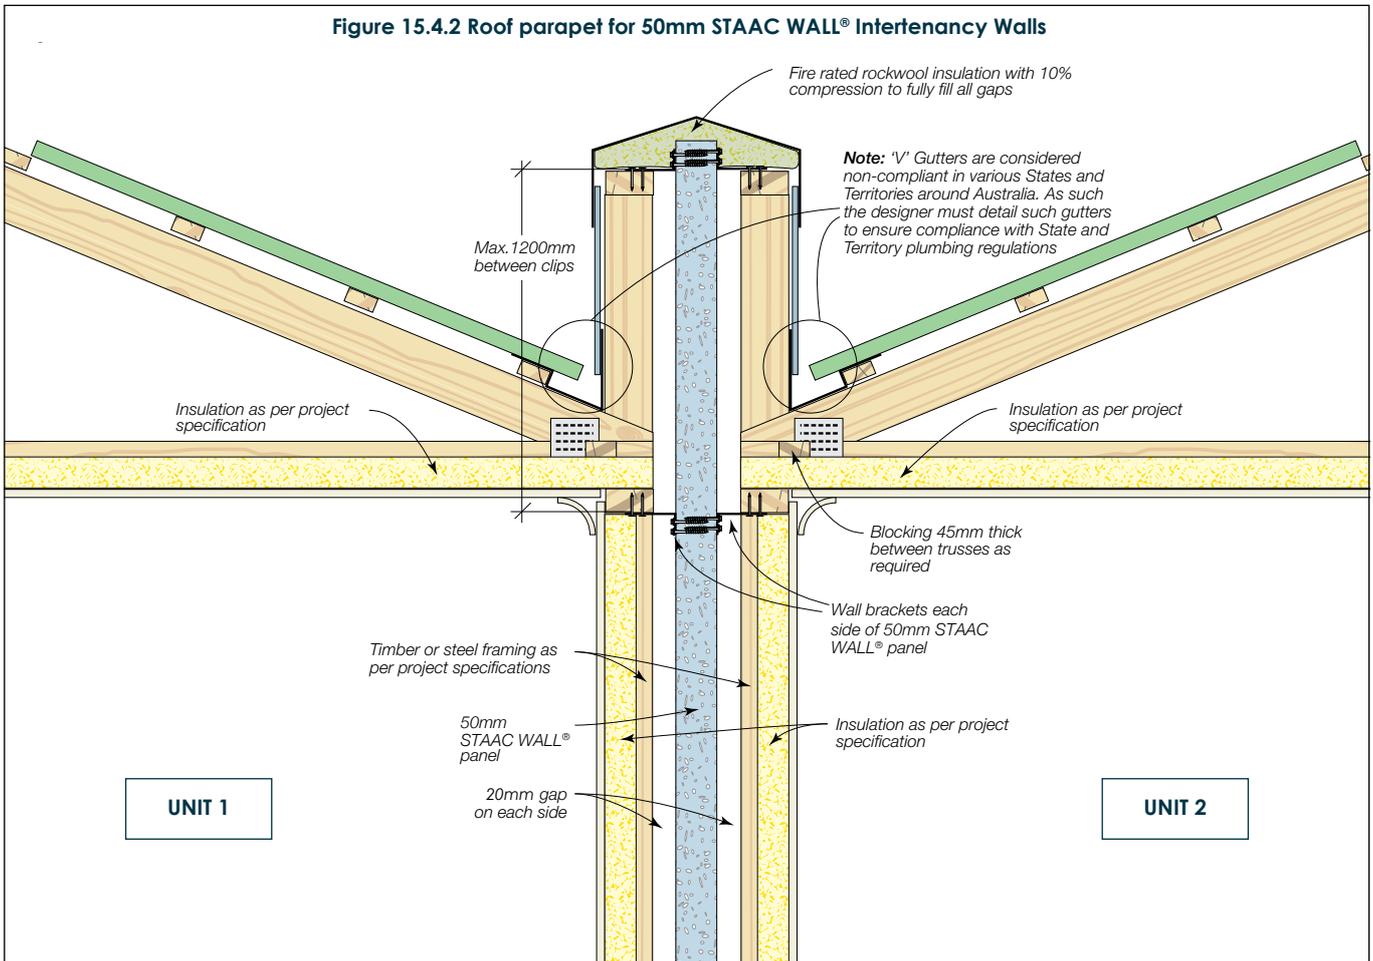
Roof parapet for 50mm STAAC WALL® Intertency Walls
